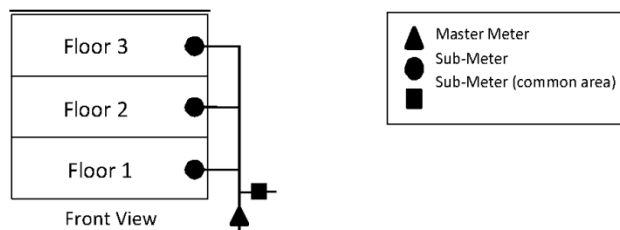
Sub-metering Configuration for Apartment Buildings
